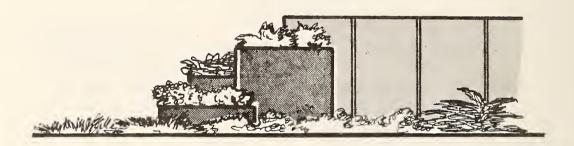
ALTERNATE MEANS OF TERMINATING BARRIER WALLS
